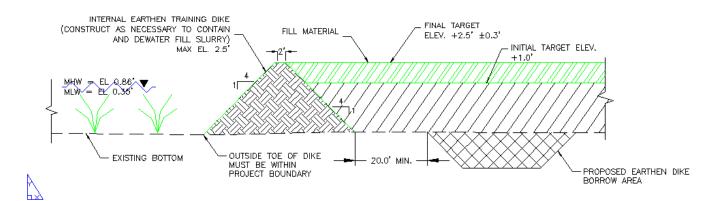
Typical Cross Section of Internal Earthen Training Dikes
